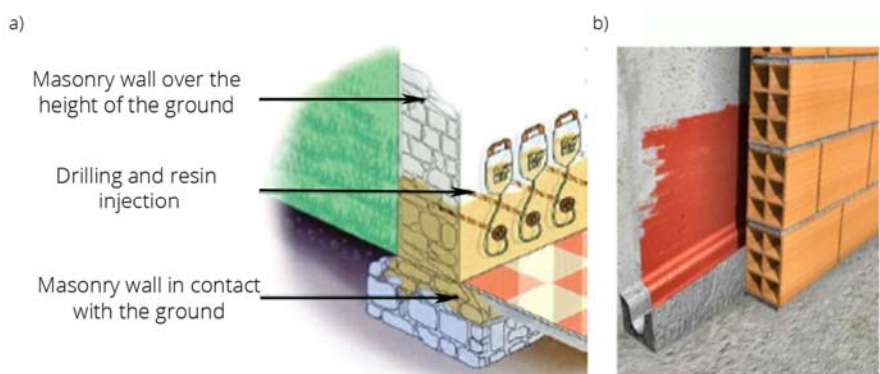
Intervention proposal. a) Detail of the execution of the court capillary barrier. b) Drainage system proposal to the wall buried.
